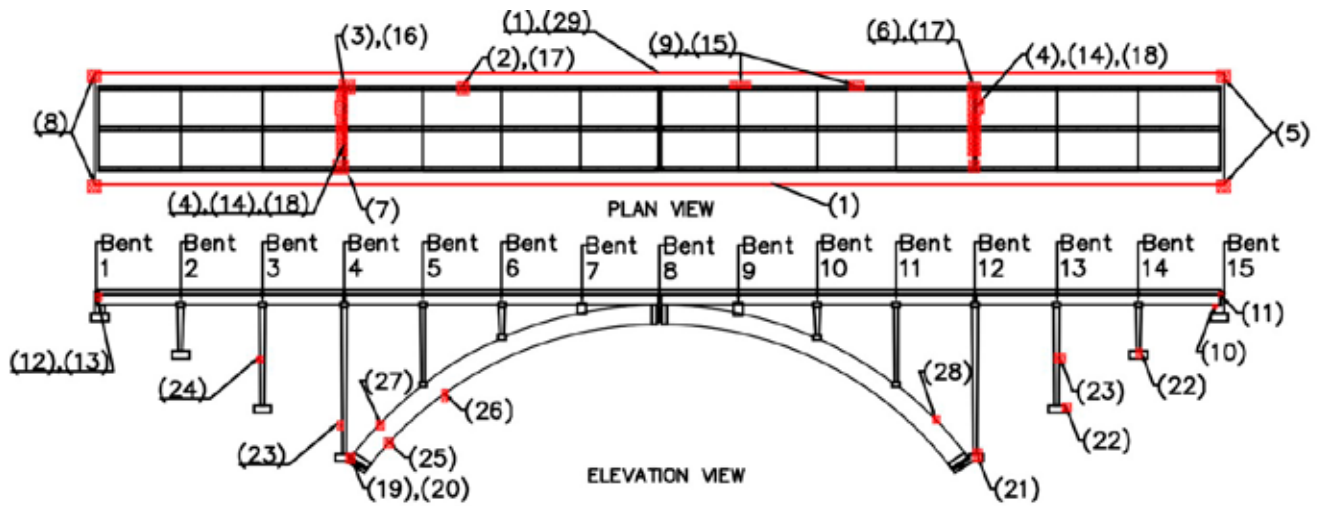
Damage location on Keystone Wye arch bridge. (Red rectangles in plan and elevation views indicate damage, and red lines in plan view denote minor cracks along the parapet and rusting in railing in a longitudinal direction. Numbering corresponds to damage summarized in Table 24.)
